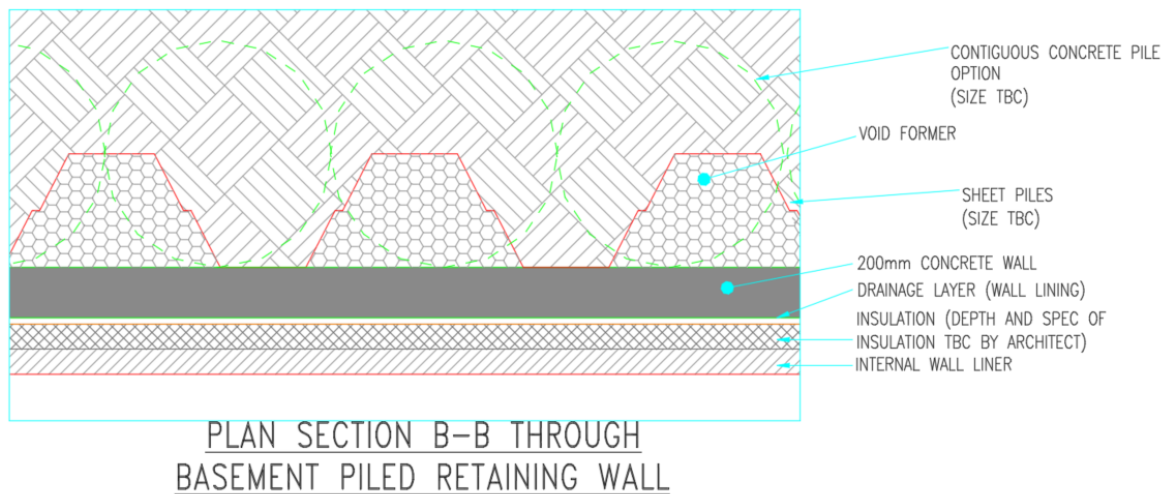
Typical plan Sections through retained piled Basement Wall Construction
